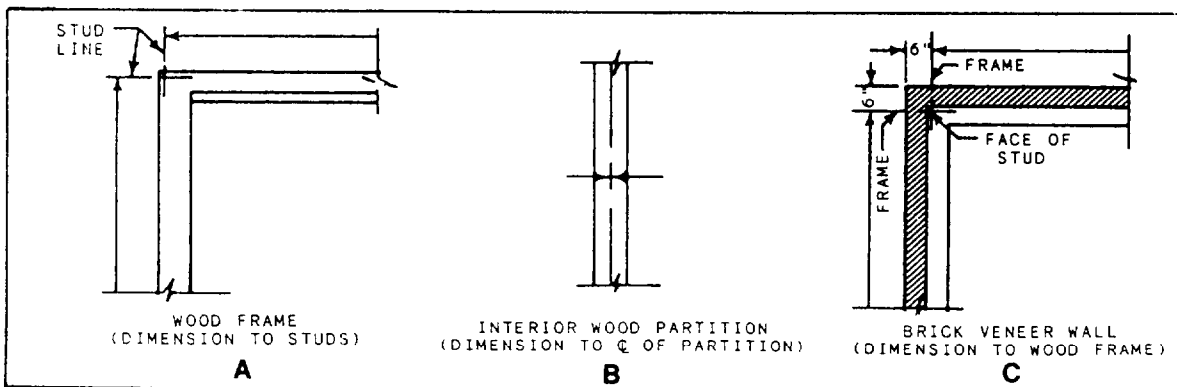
Dimensioning wood-frame and veneer construction.
